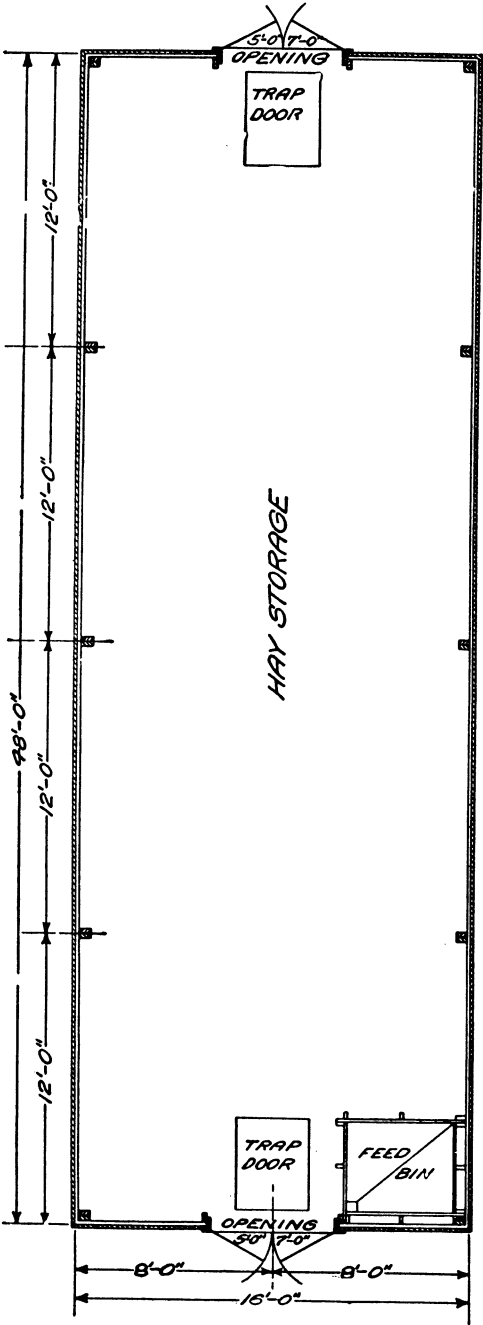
Second-floor plan of barn shown in Figure 8.
